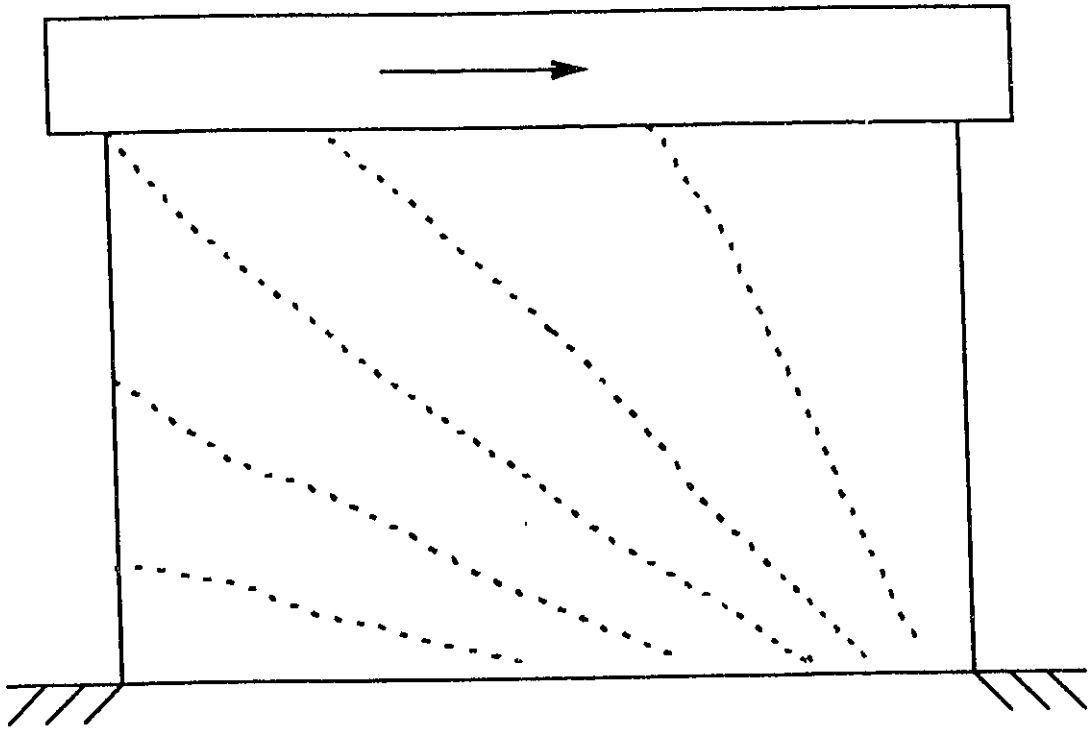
Crack Pattern in Low-Rise Shear Walls
